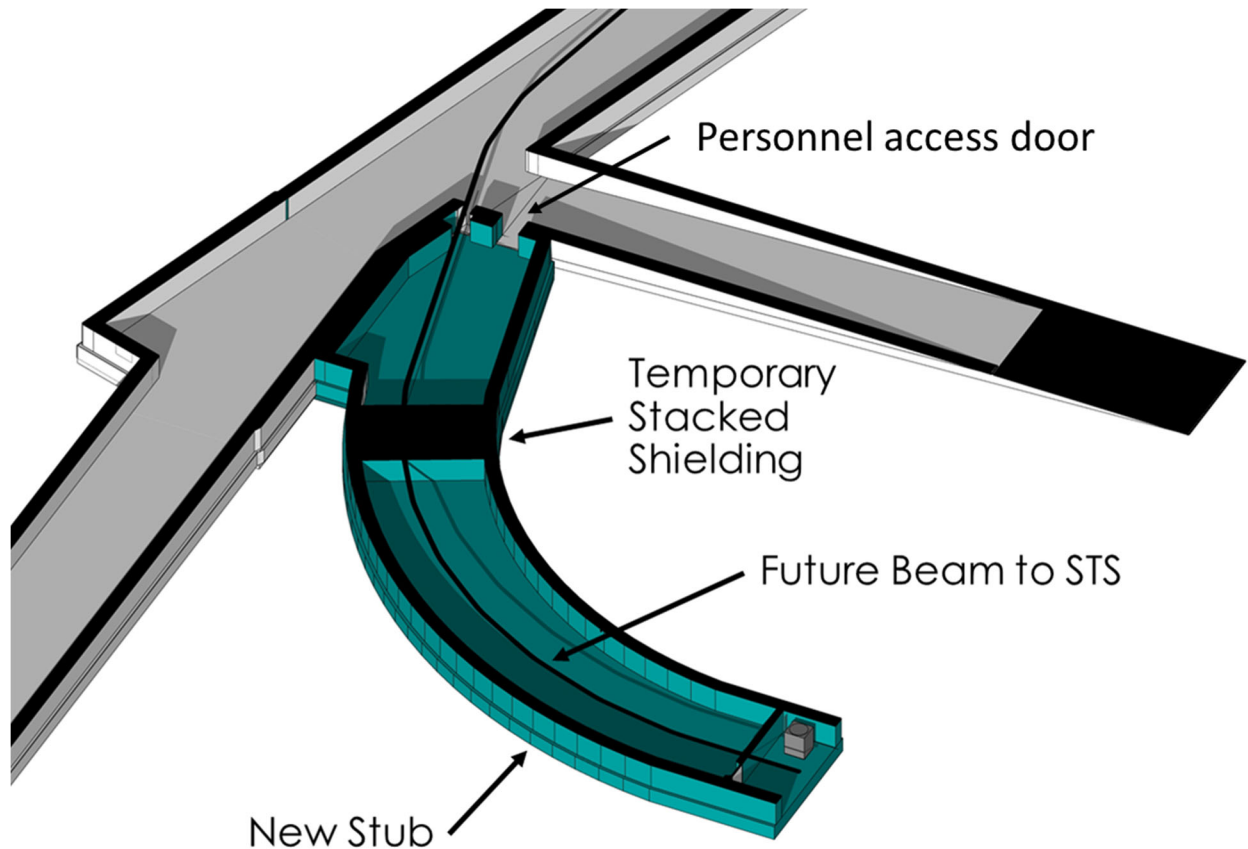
Cross-section of RTBT stub to illustrate internal geometry.
